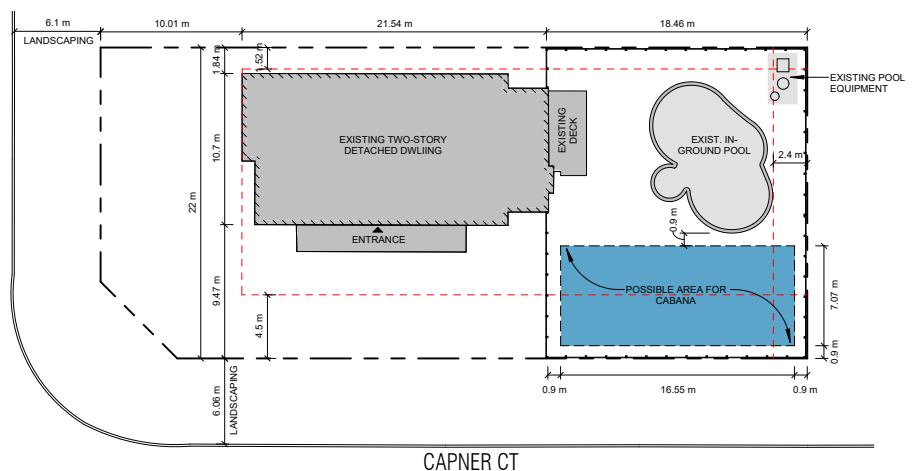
Existing Dwelling And Proposed Cabana Site Plan with Zoning Setback
